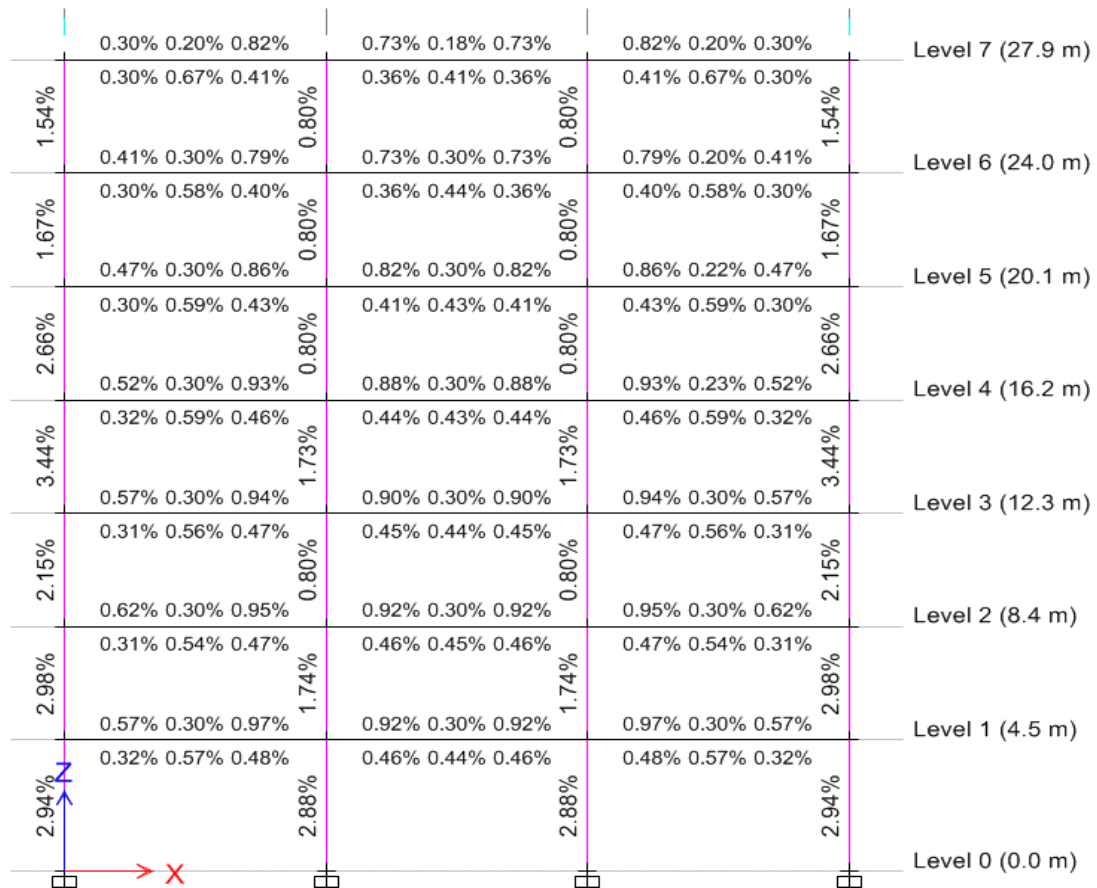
Required longitudinal reinforcement for building ID 2207
